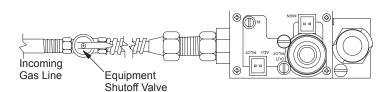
Turning Equipment Shutoff Valve to the OFF Position
